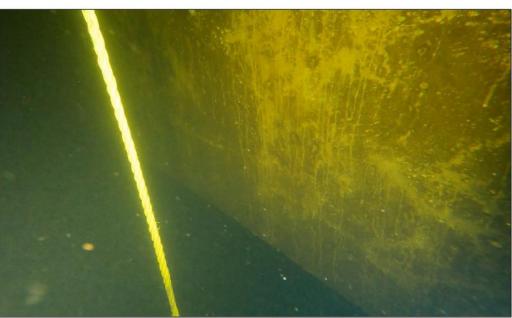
View of the typical condition of the welds beneath the rust scaling on the steel pile Photograph 15 View of typical rust nodules on the steel pile casings of Pier 2. casings on Pier 2.
